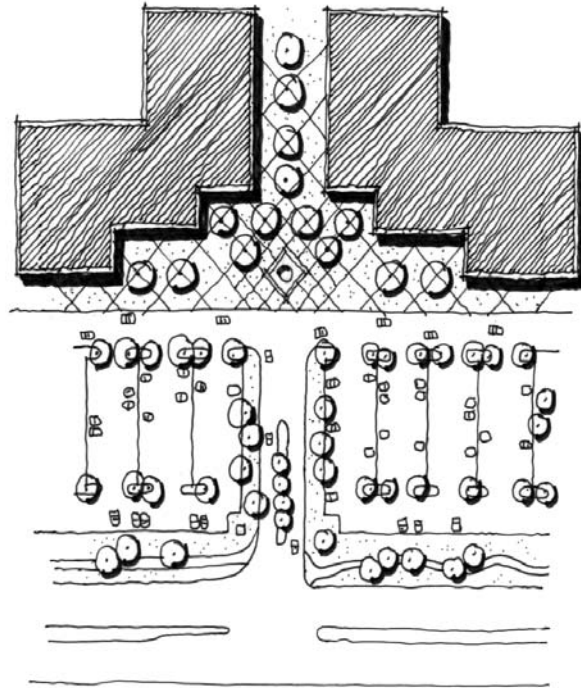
This development pattern uses buildings to frame an internal open space or plaza to give the center focus. Primary buildings orient to the plaza.
